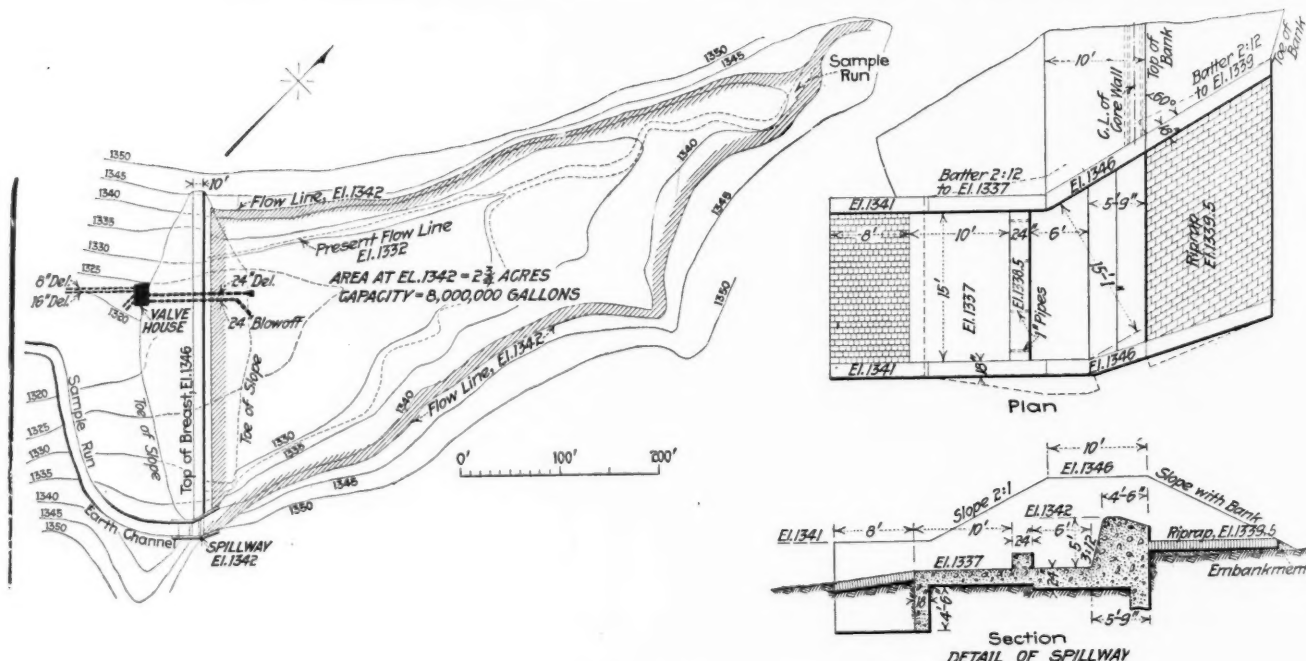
PLAN OF RESERVOIR AND DETAILS OF SPILLWAY
